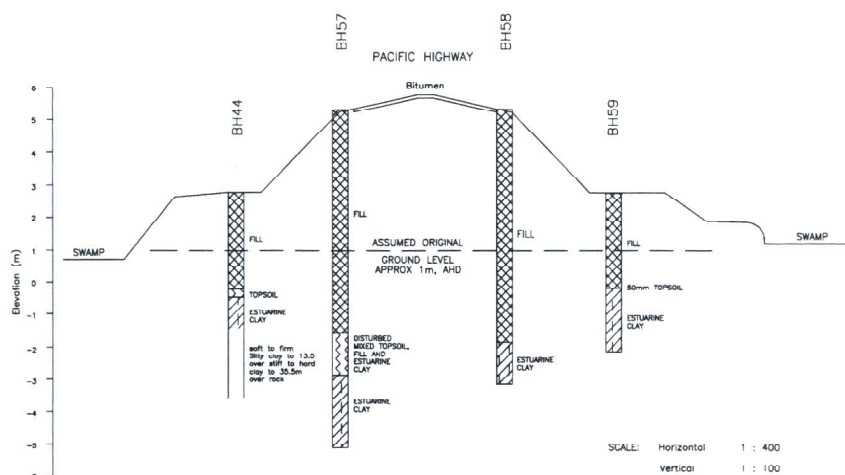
Inferred Cross Section Through Pacific Highway Embankment
